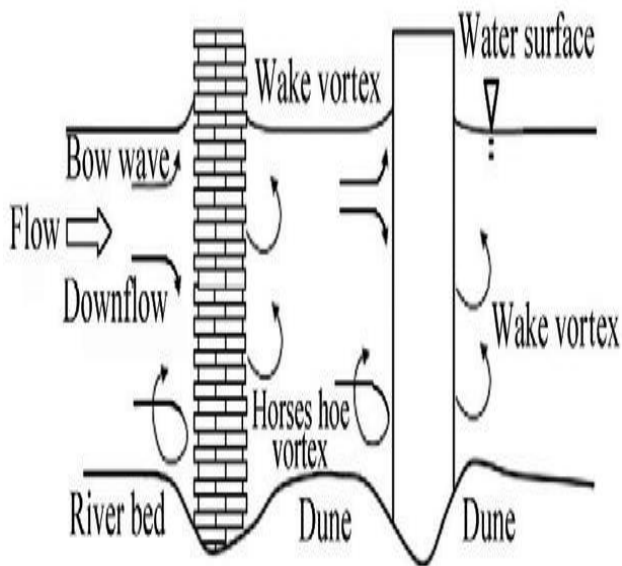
Provision Of Ring Column Before Bridge Pier[24]
